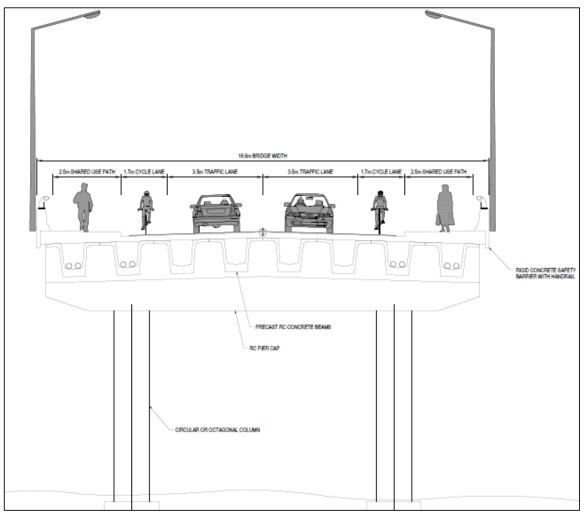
Typical cross section for the proposed bridge. Source: Stantec drawing 310205125-01-001-C303, Rev A, dated 3.05.2022.
